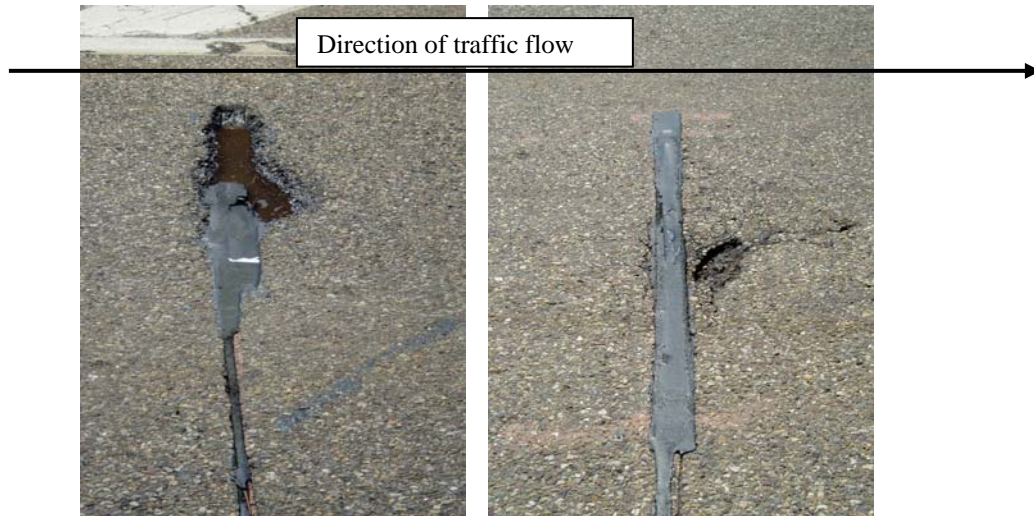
Failure of sensor assemblies; outside of lane (left) and inside of lane (right).
